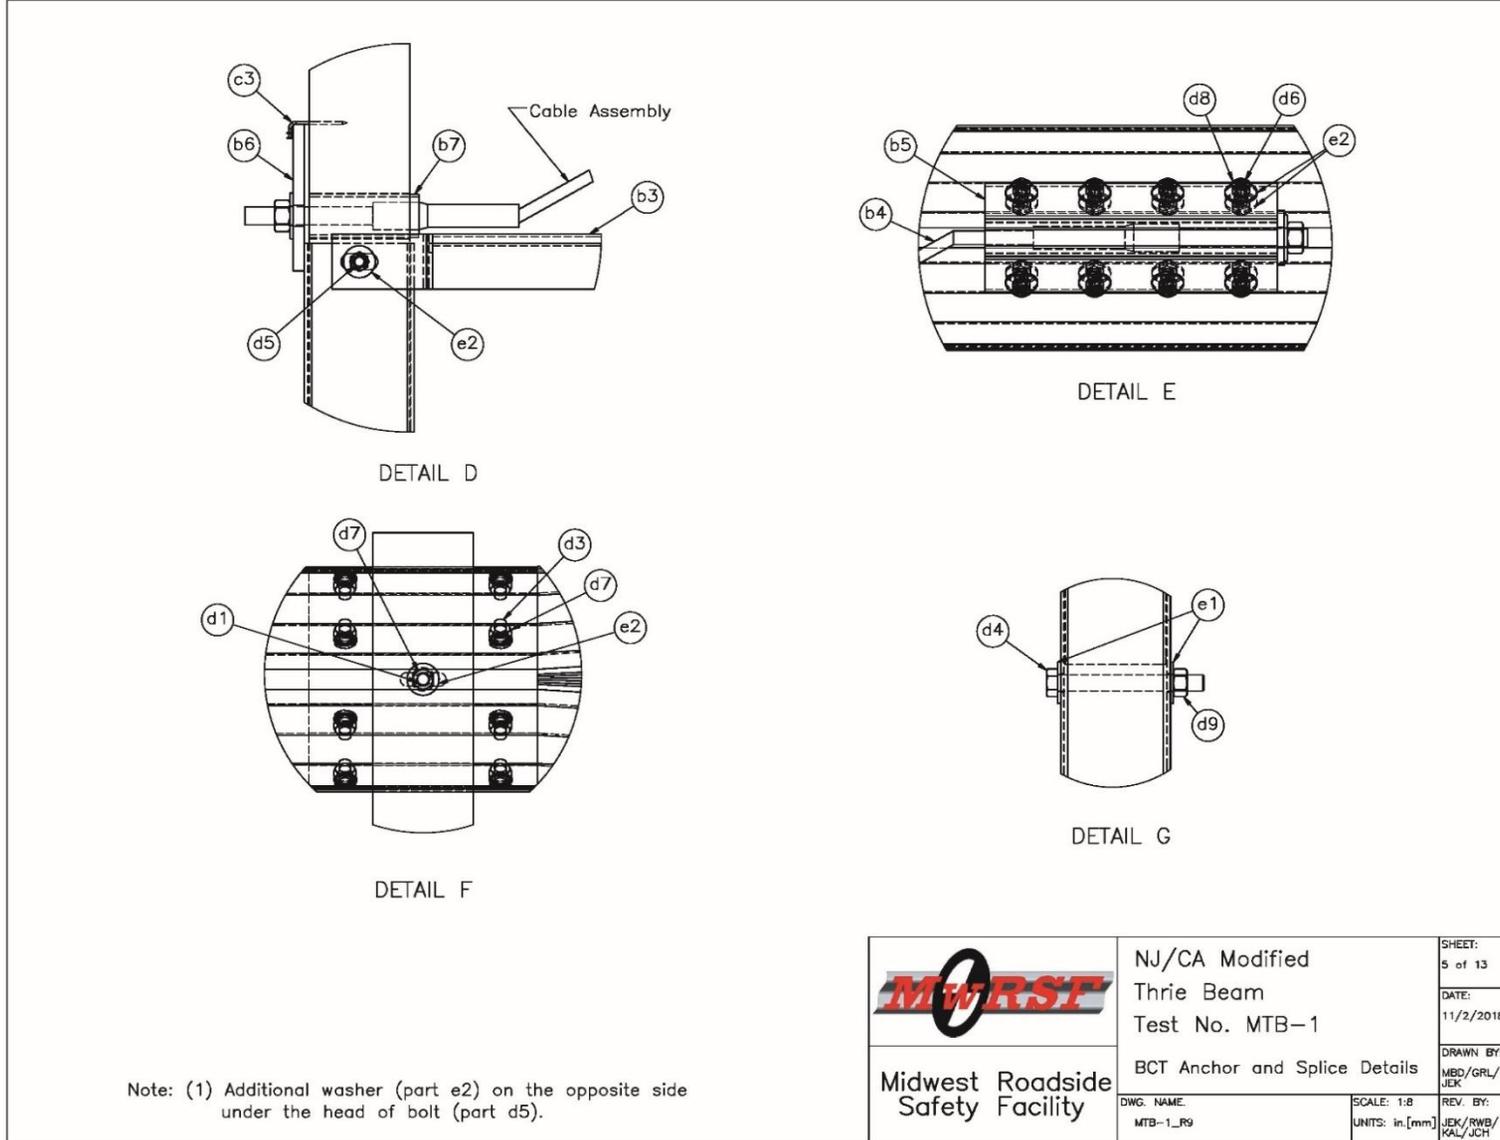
BCT Anchor and Splice Details, Test No. MTB-1
